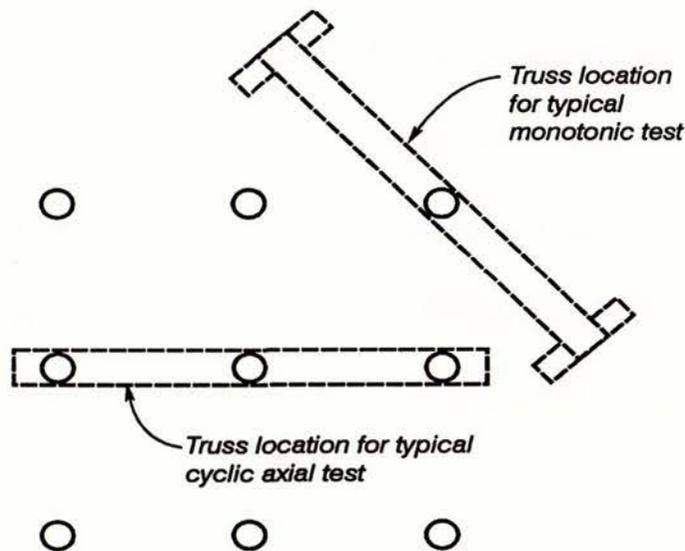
Truss layout for monotonic uplift and cyclic load tests.
